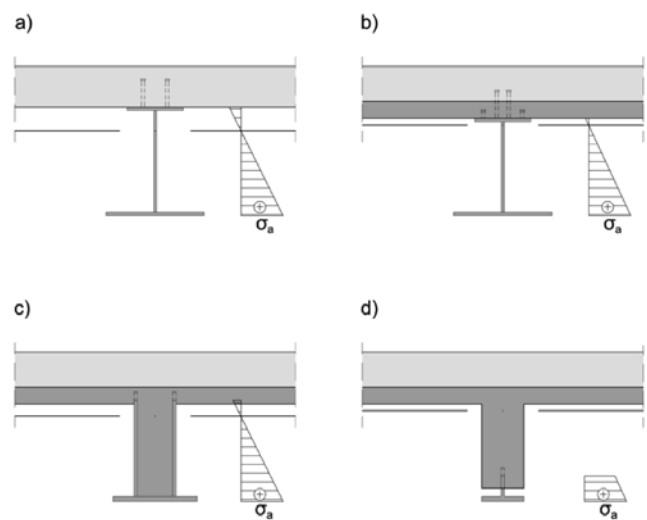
Stress distribution on: a) common composite steel and concrete beam, b) pcb girder, c) + d) pcb-W girder [5]
